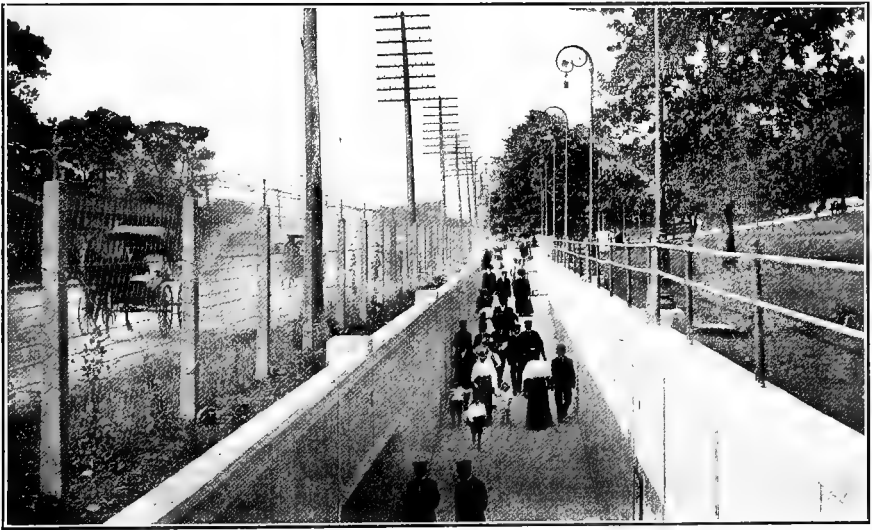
RETAINING WALLS AT DELLWOOD PARK, JOLIET, ILL.
